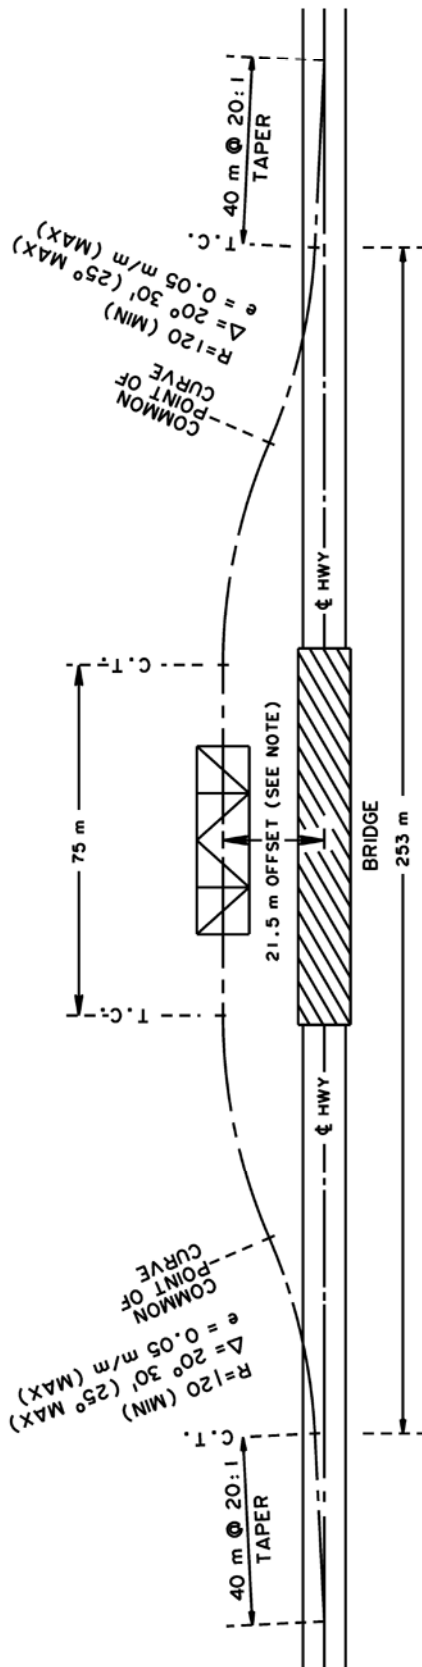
Typical Plan View for Bridge Detour (3 Curves)
